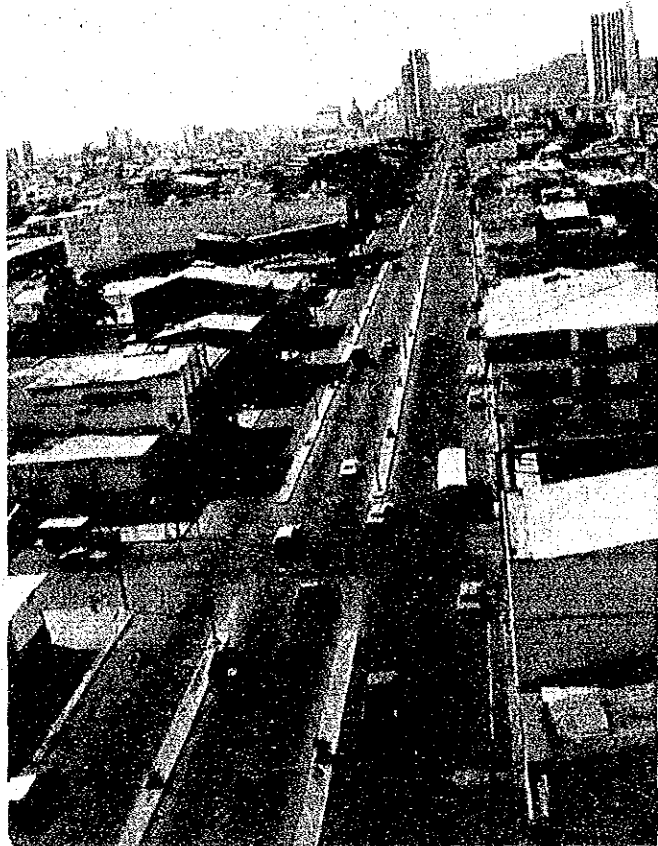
TYPICAL PRESENT CROSS - SECTION
